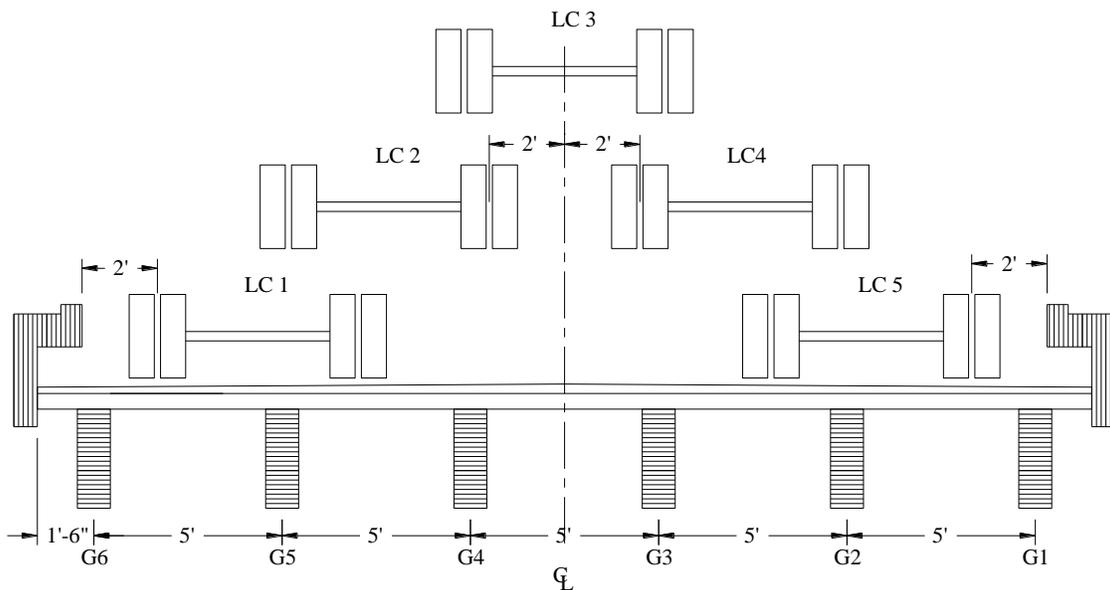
Load cases for demonstration bridge 2009 testing (looking north)
